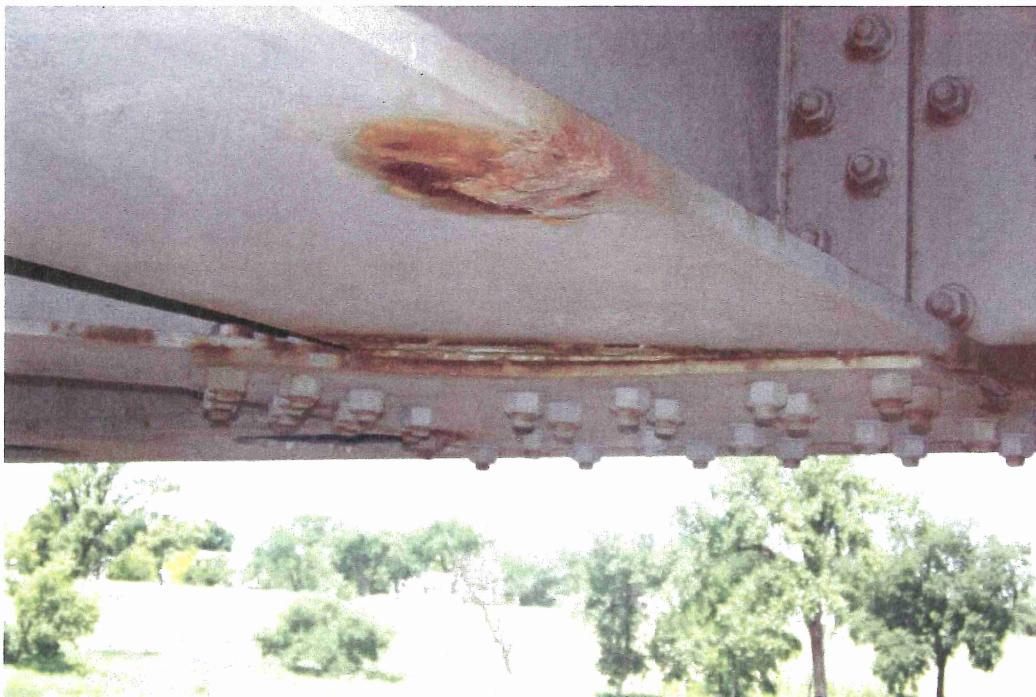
East Truss Span (Span 7), north truss at panel point L3'. Note pack rust (3/8") between lower horizontal connection plate to bottom flange of floorbeam. This condition is randomly found throughout the truss spans.
